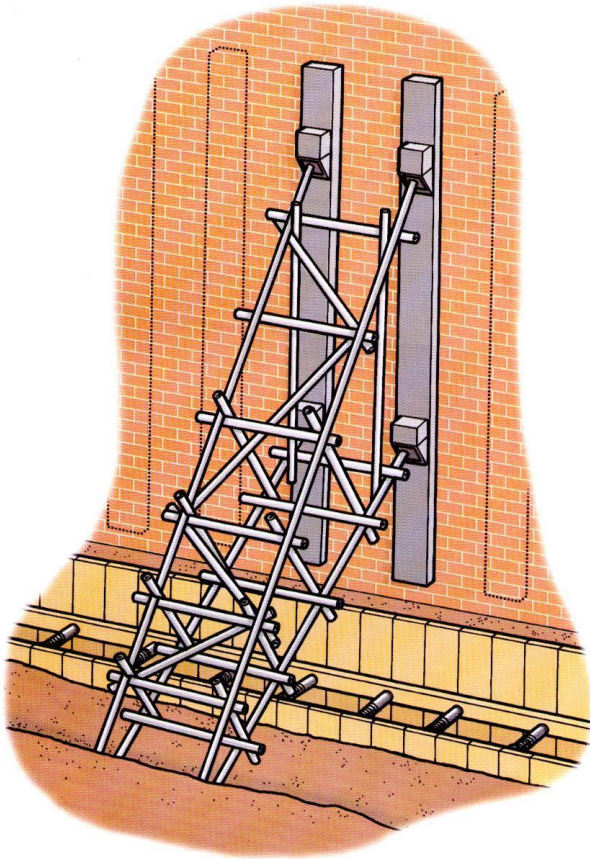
Shoring of building with excavation at base of building (HSE, 1999)
